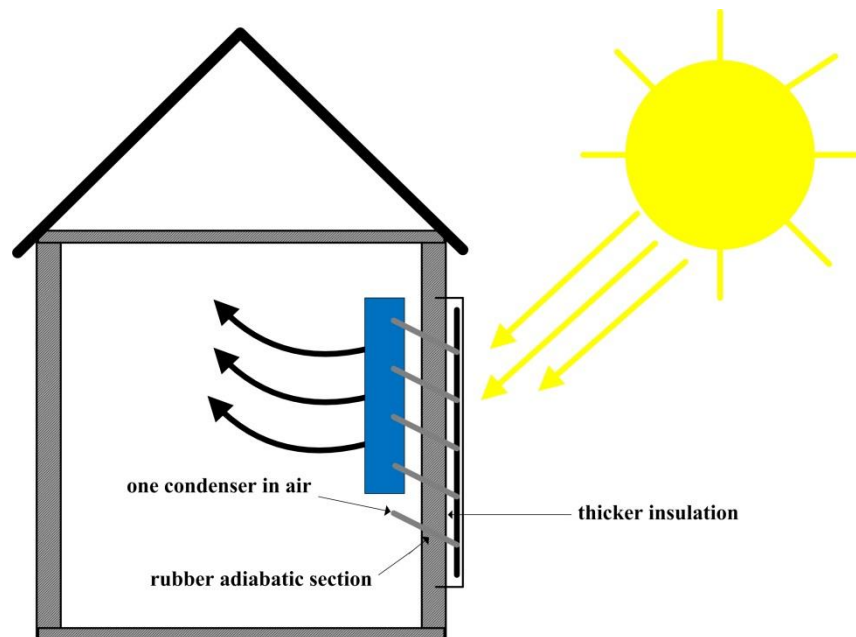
Schematic of a new model of the heat pipe wall prototype highlighting significant design modifications of the previous model.
